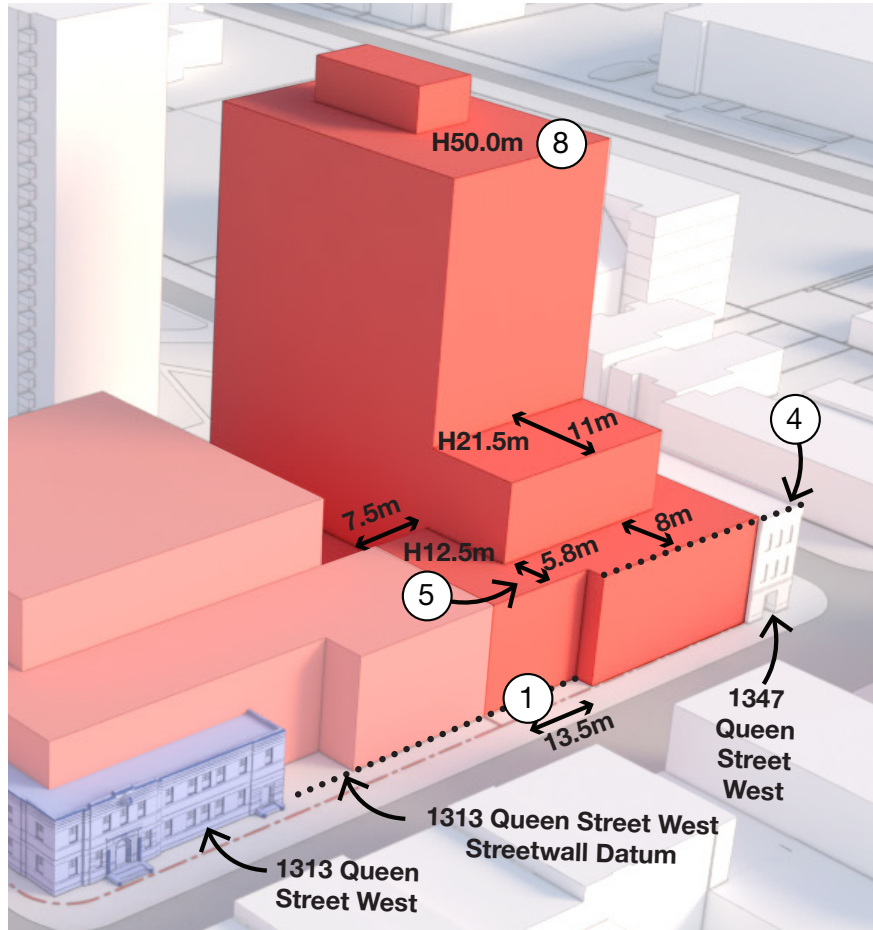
/ West Block massing model: front view (view looking southwest from Queen Street West).
